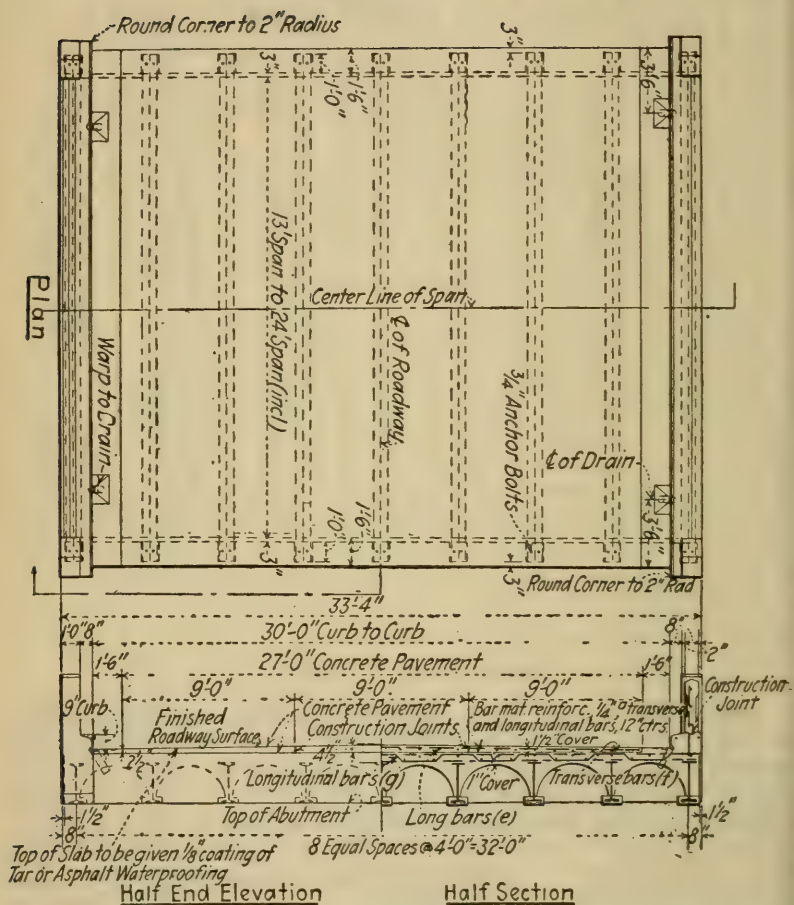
Steel I-beam stringer superstructures. (H-20 loading.)
